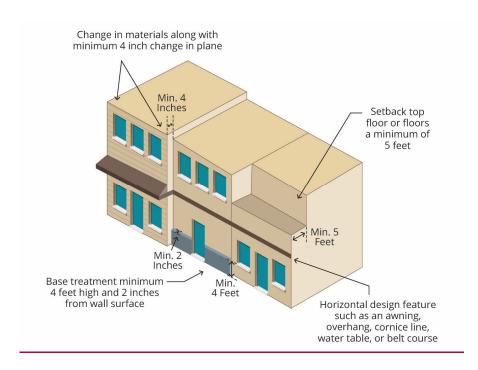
E MIXED USE BUILDINGS, VERTICAL ARTICULATION
